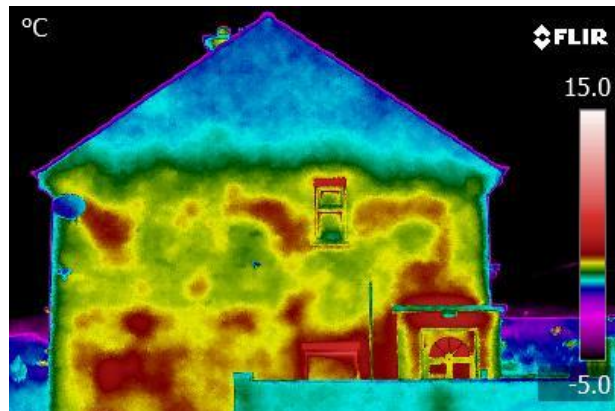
Inconsistencies across wall façade apparent. Note distinction across joist-line corroborating installation of loft insulation
